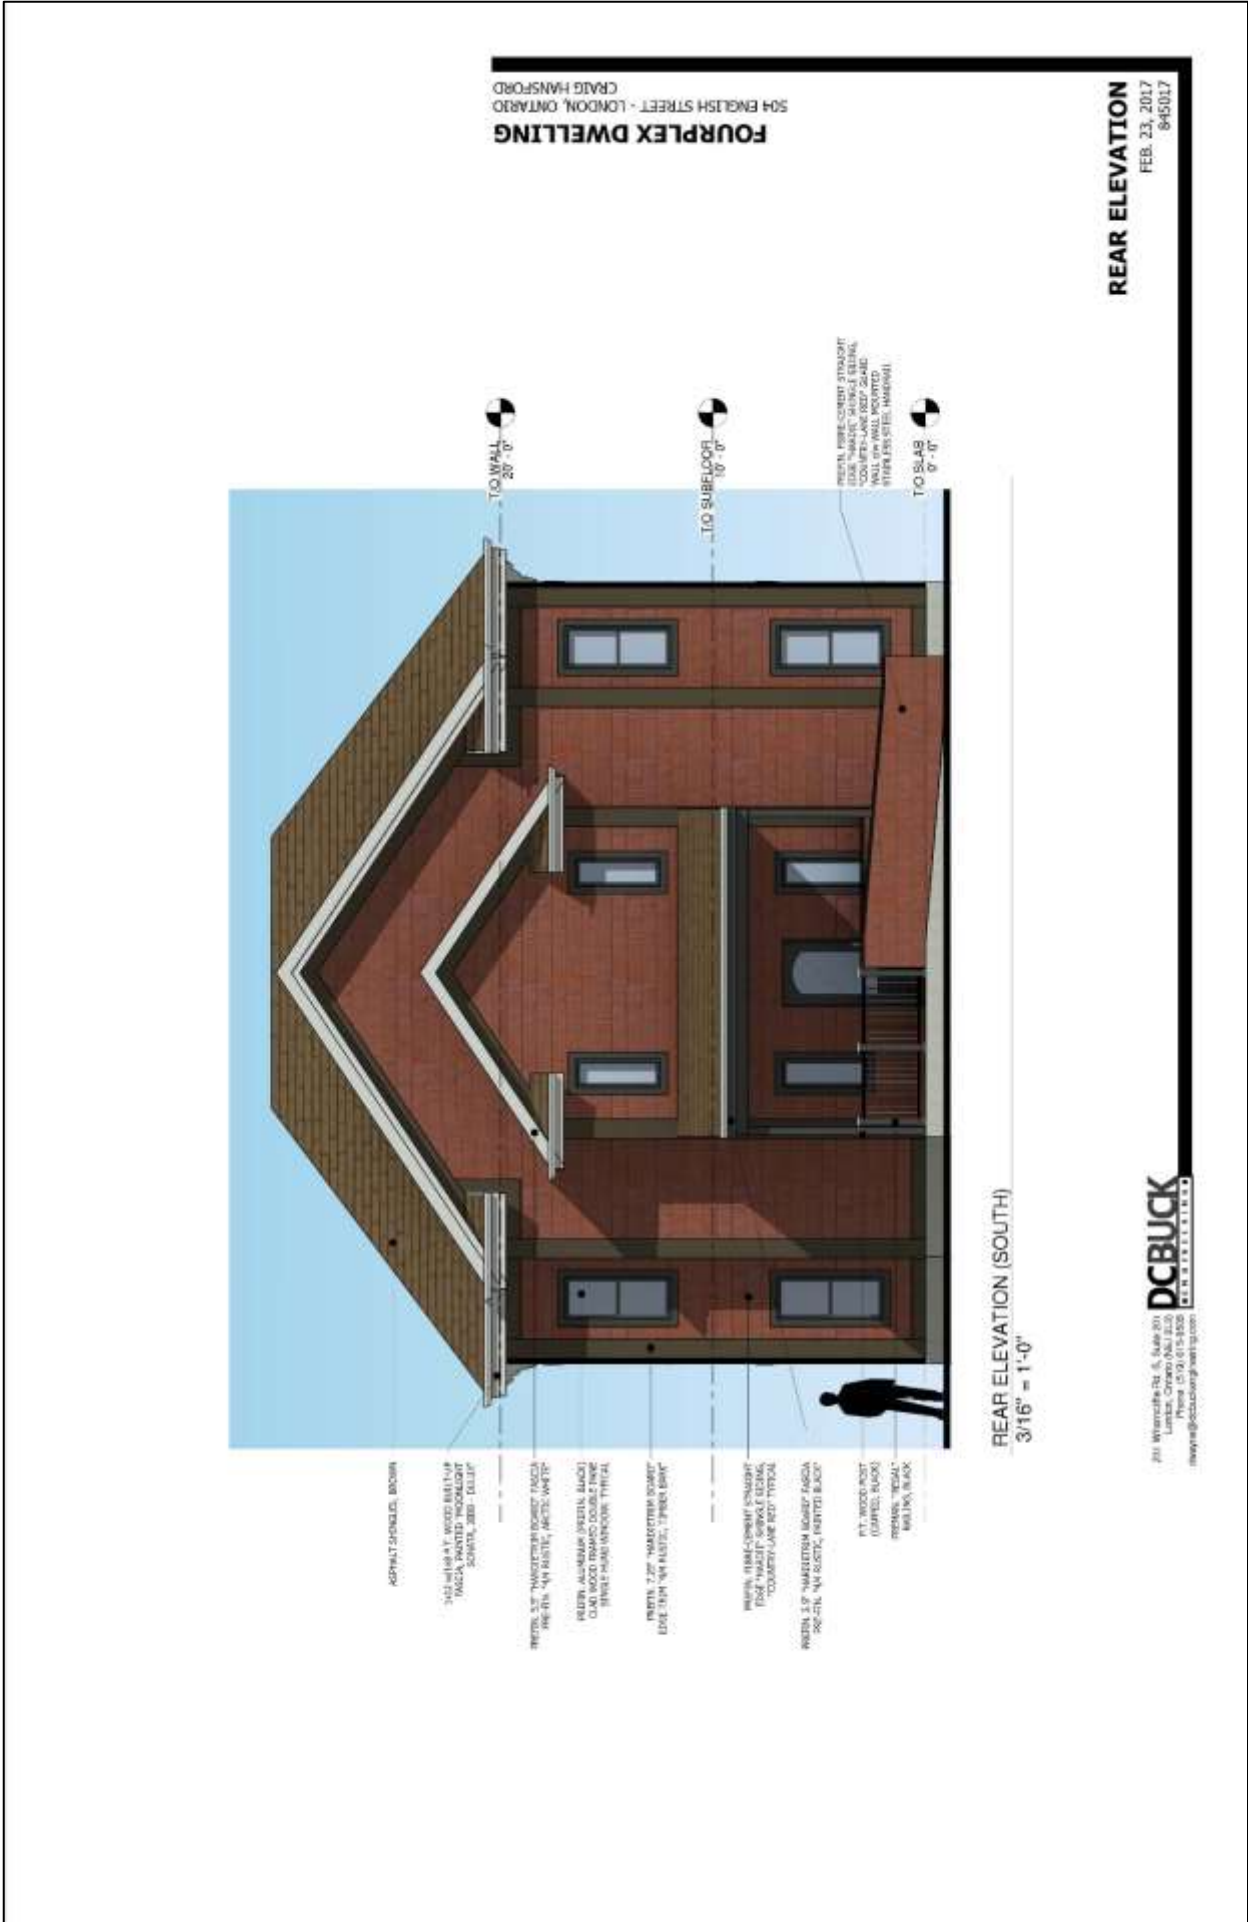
Rear (east) elevation of proposed building at 504 English Street.
